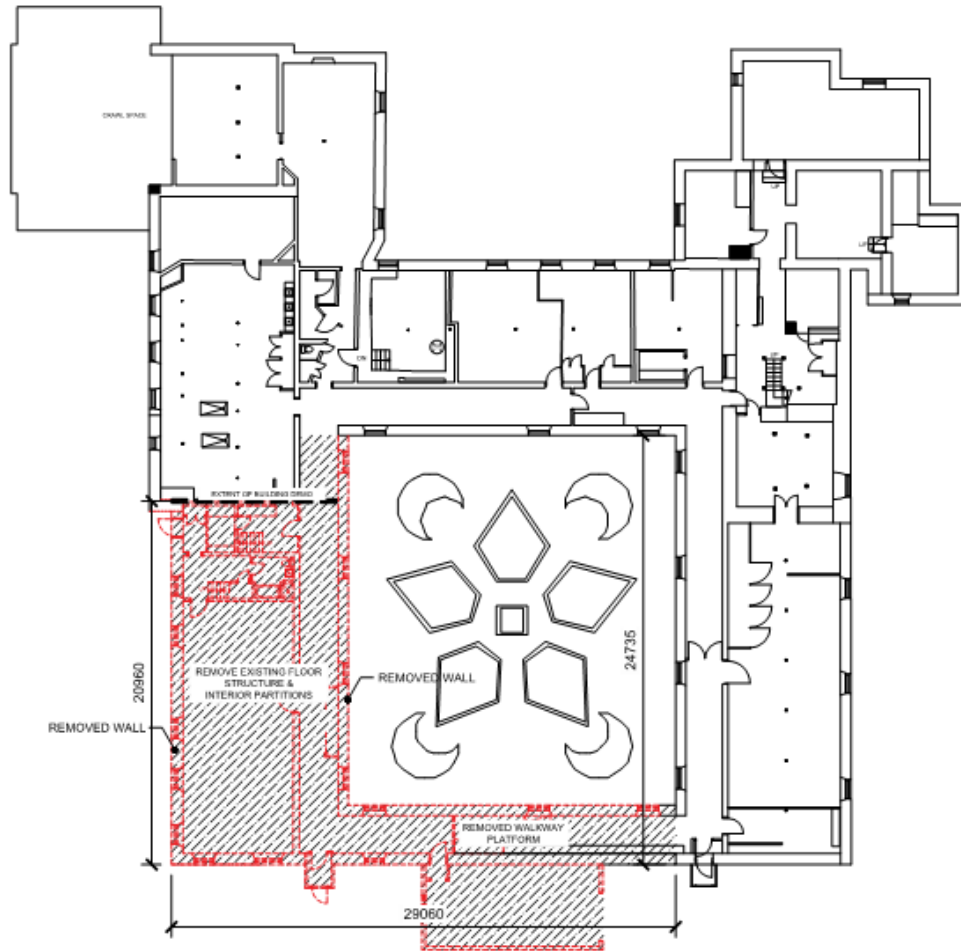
Ratio of demolition, first floor (typical). Credit: Roderick Lahey Architect.
